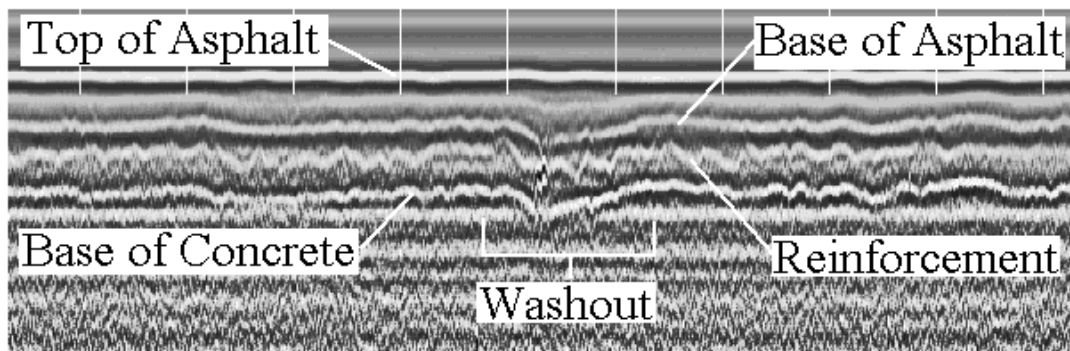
Example GPR profile at 123 mile westbound showing radar signature of possible washout affecting all pavement layers (base of concrete, concrete reinforcement and asphalt overlay).
